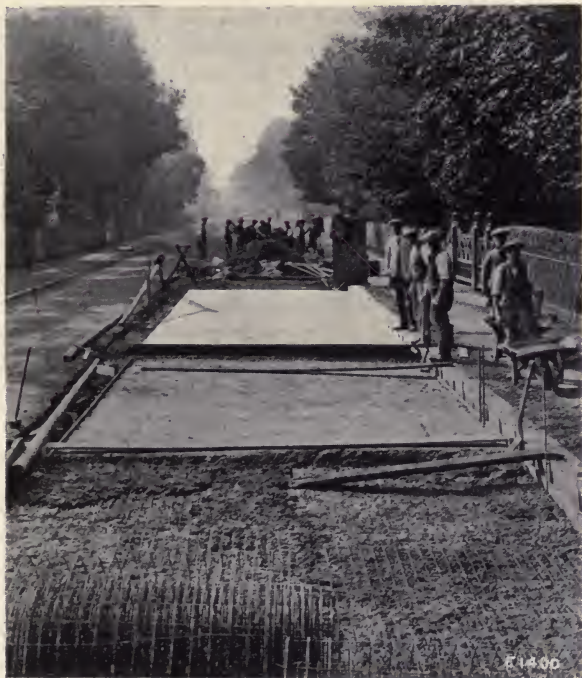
The reinforced concrete road under construction at Buckhurst Hill.
